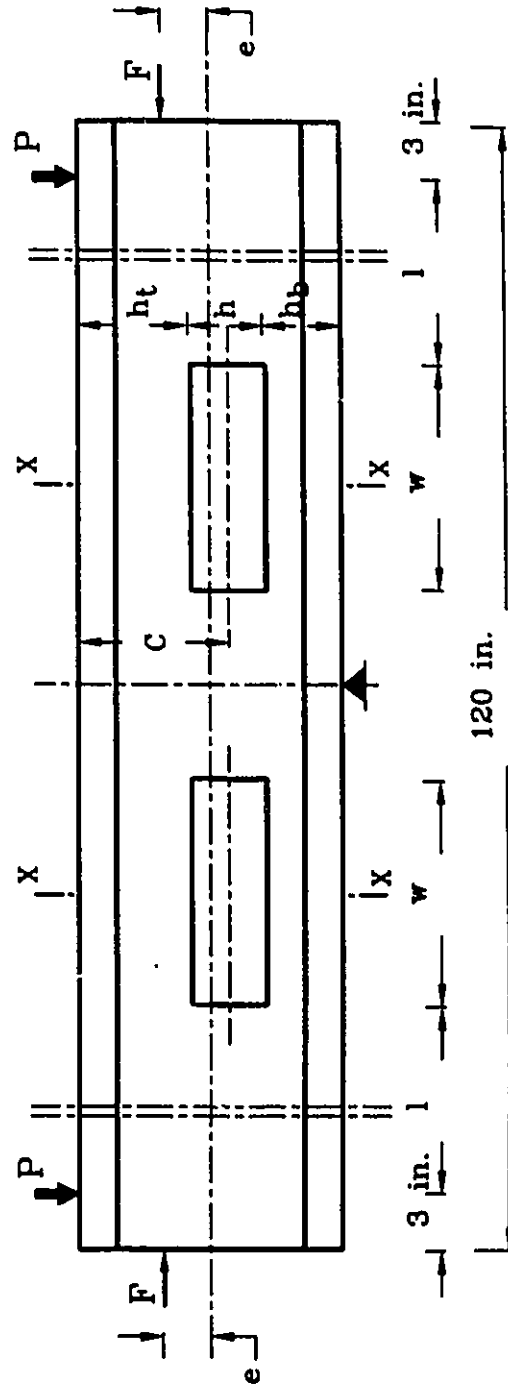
TYPICAL I-BEAM LAYOUT
